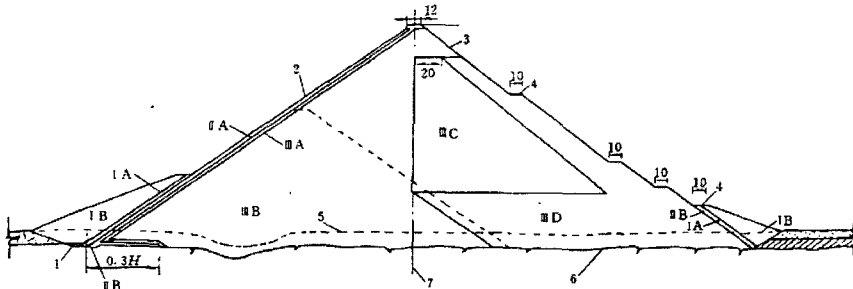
Zoning of TSQ-1 CFRD (1. toe plate, 2. concrete face slab, 3. slope protection 4. access road, 5. ground line, 6. bedding rock, 7. dam axis, I A. clay blanket, I B. random fill, II A. bedding zone, II B. bedding zone, $d_{max} < 40mm$, III A. transition zone, III B. main rockfill zone, III C. downstream rockfill, III D. drainage rockfill zone, after Jiang, 2000)
